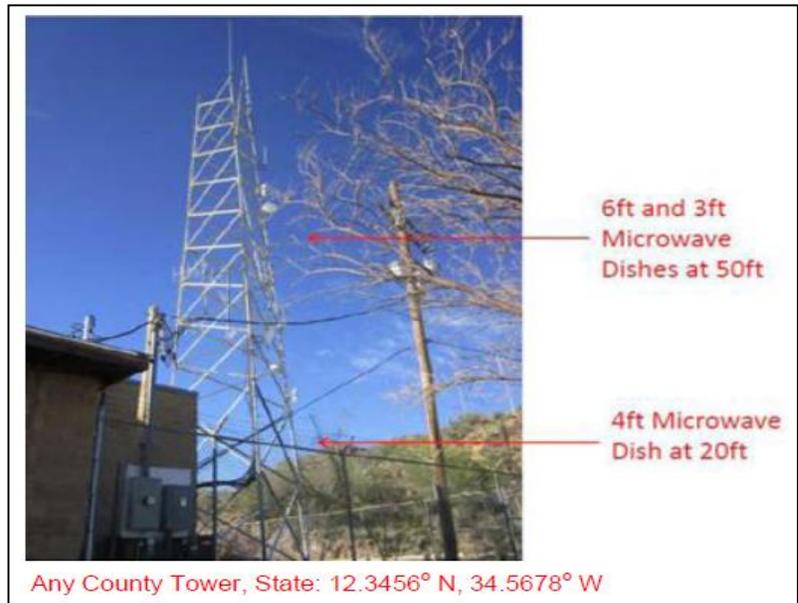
Ground-level photograph showing proposed locations of new communications equipment on an existing tower.
